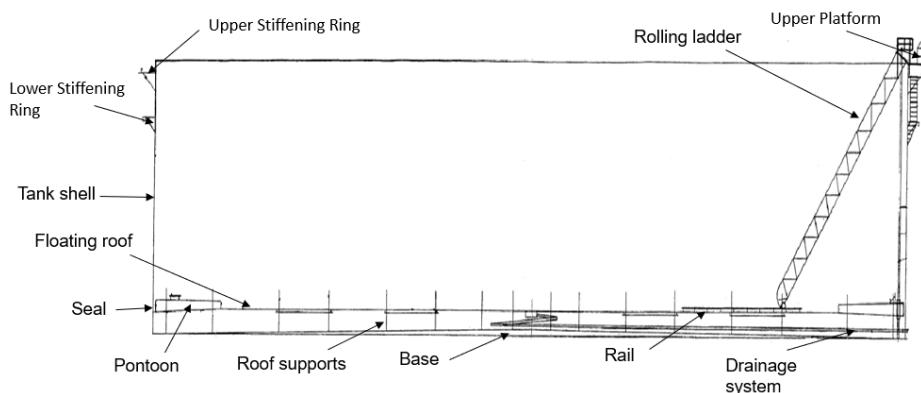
Case study: single deck floating roof broad storage tank (TK-59).
